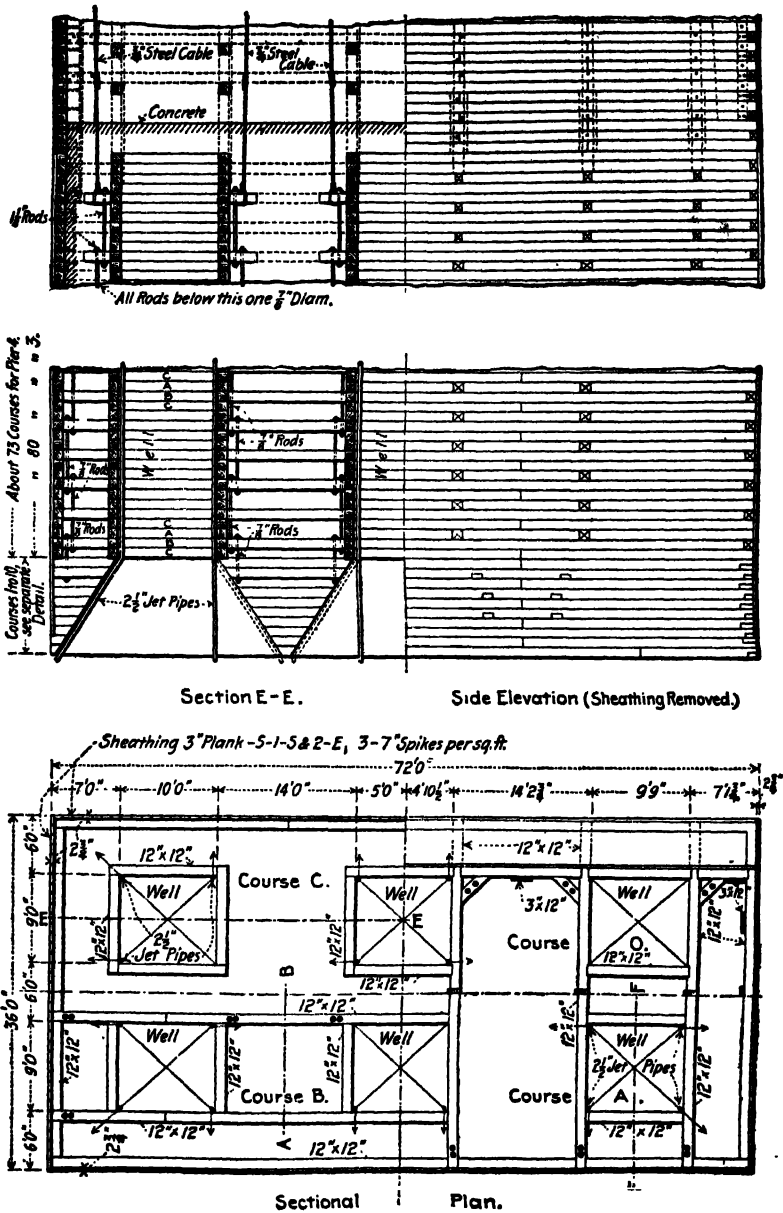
Open-dredging Caisson and Cofferdam for the O.-W. R. R. & N. Co.'s Bridge over the Willamette River at Portland, Ore.
